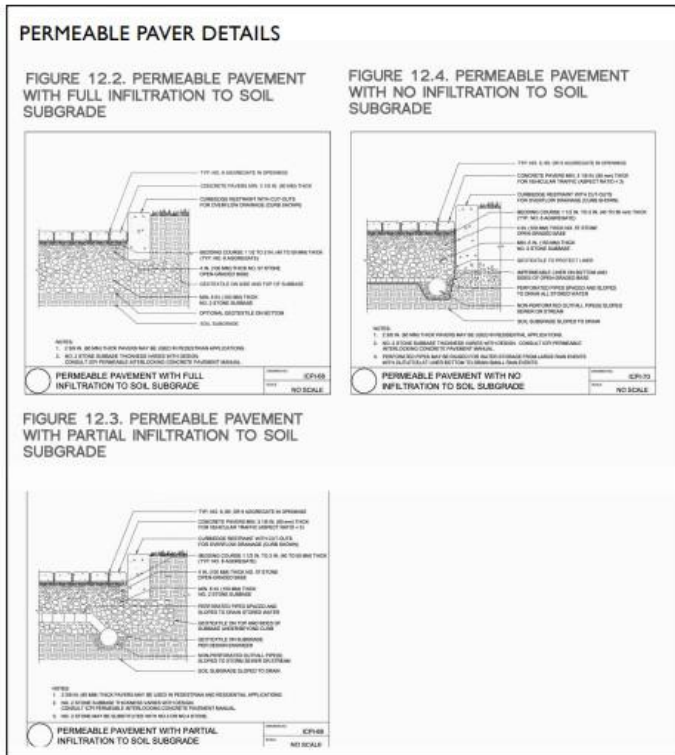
Proposed driveway details provided by Greenspace Design on the Landscape Plan.
